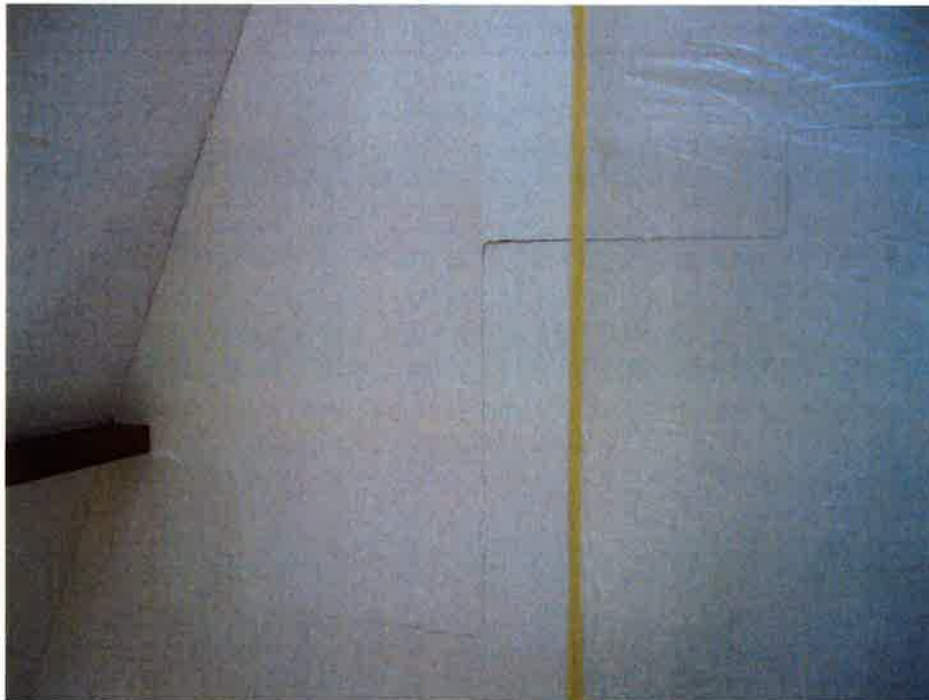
Wall separation from Pressure Grouting re-leveling of building
